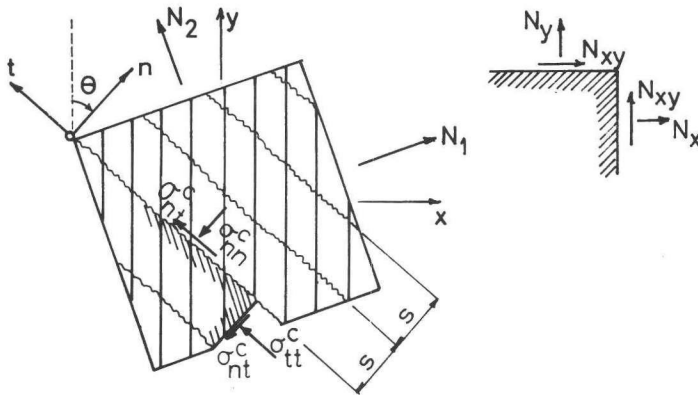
Reinforced concrete element intersected by cracks
